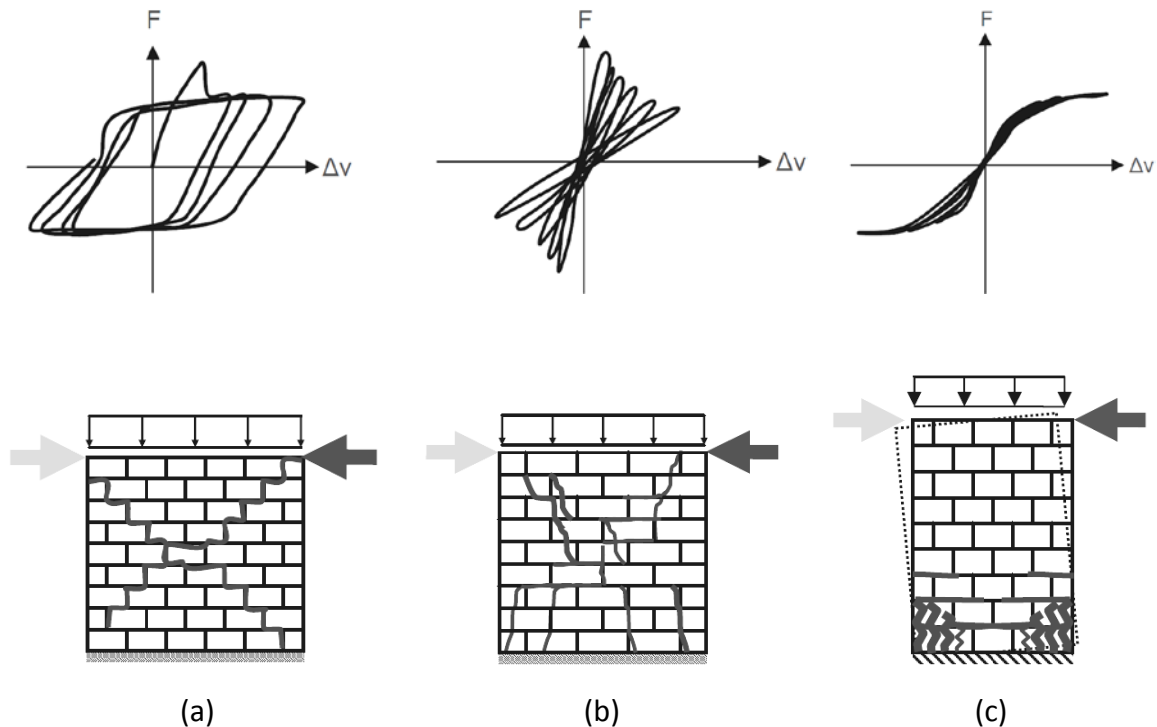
Static-cyclic tests on masonry walls; (a) stepped cracking; (b) diagonal cracking and (c) horizontal cracking and crushing [Mistler, 2006]
